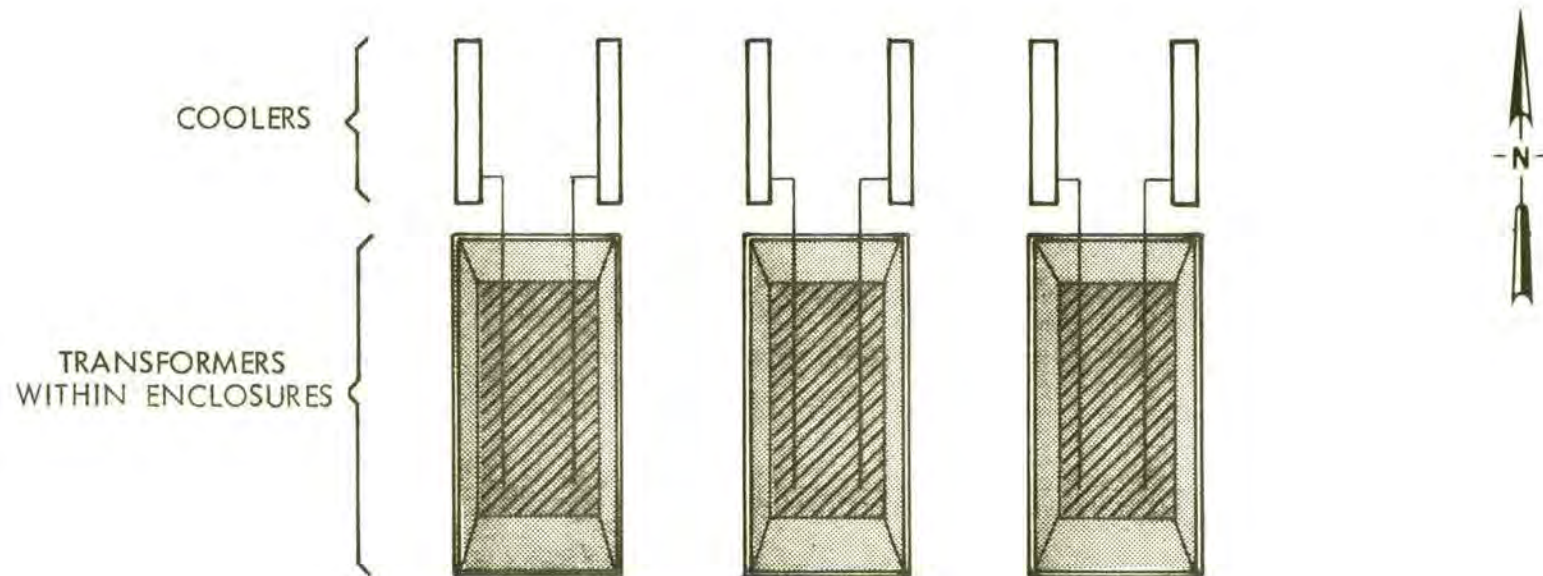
PROPOSED LAYOUT OF TRANSFORMER INSTALLATION AFTER INSTALLATION OF NOISE CONTROL TREATMENTS
